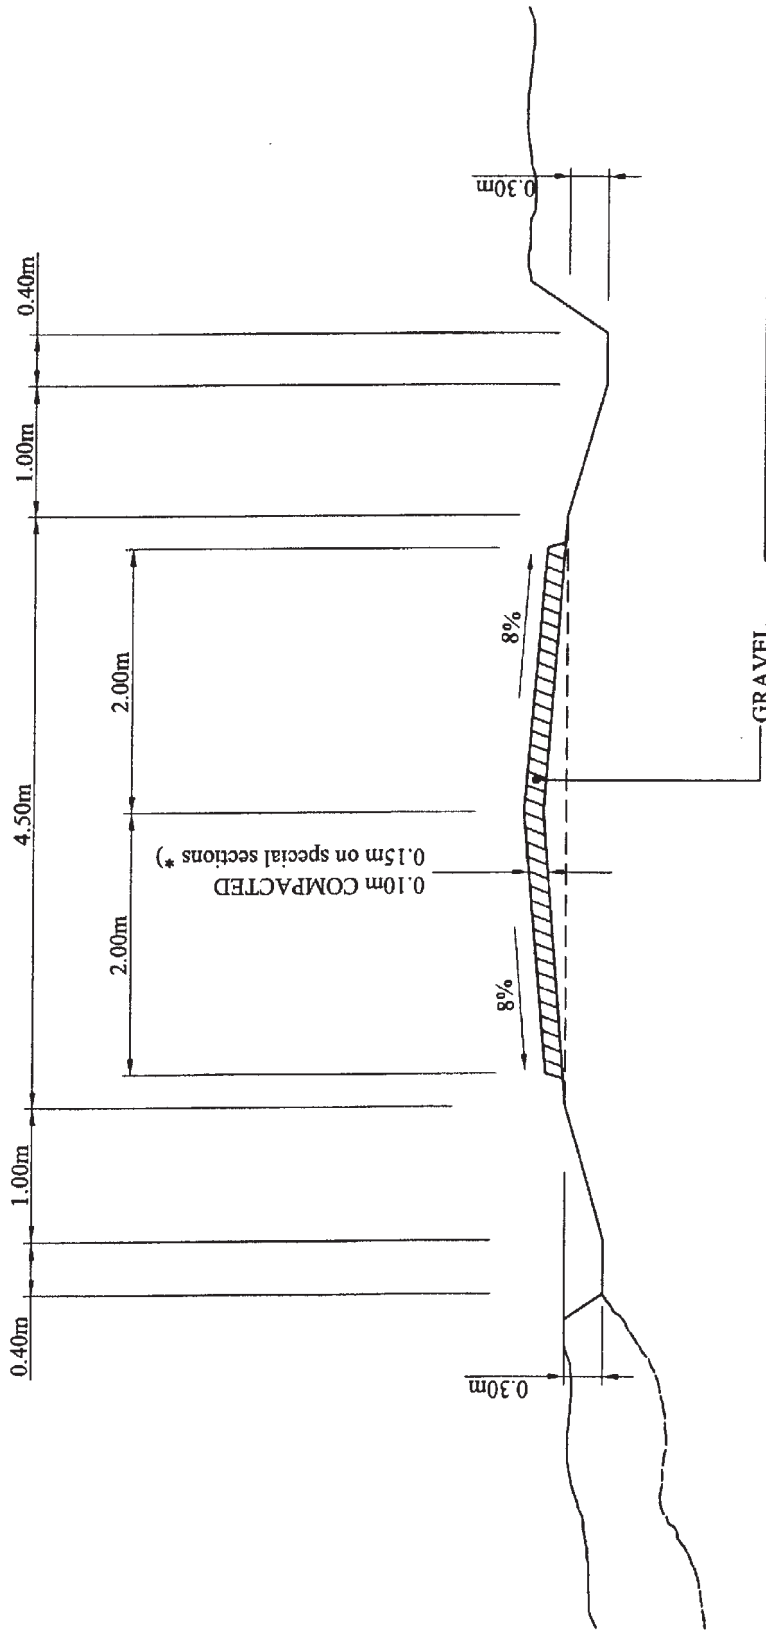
B3: DISTRICT CLASS I ROAD - CROSS SECTION 1D FOR SUPERELEVATION
